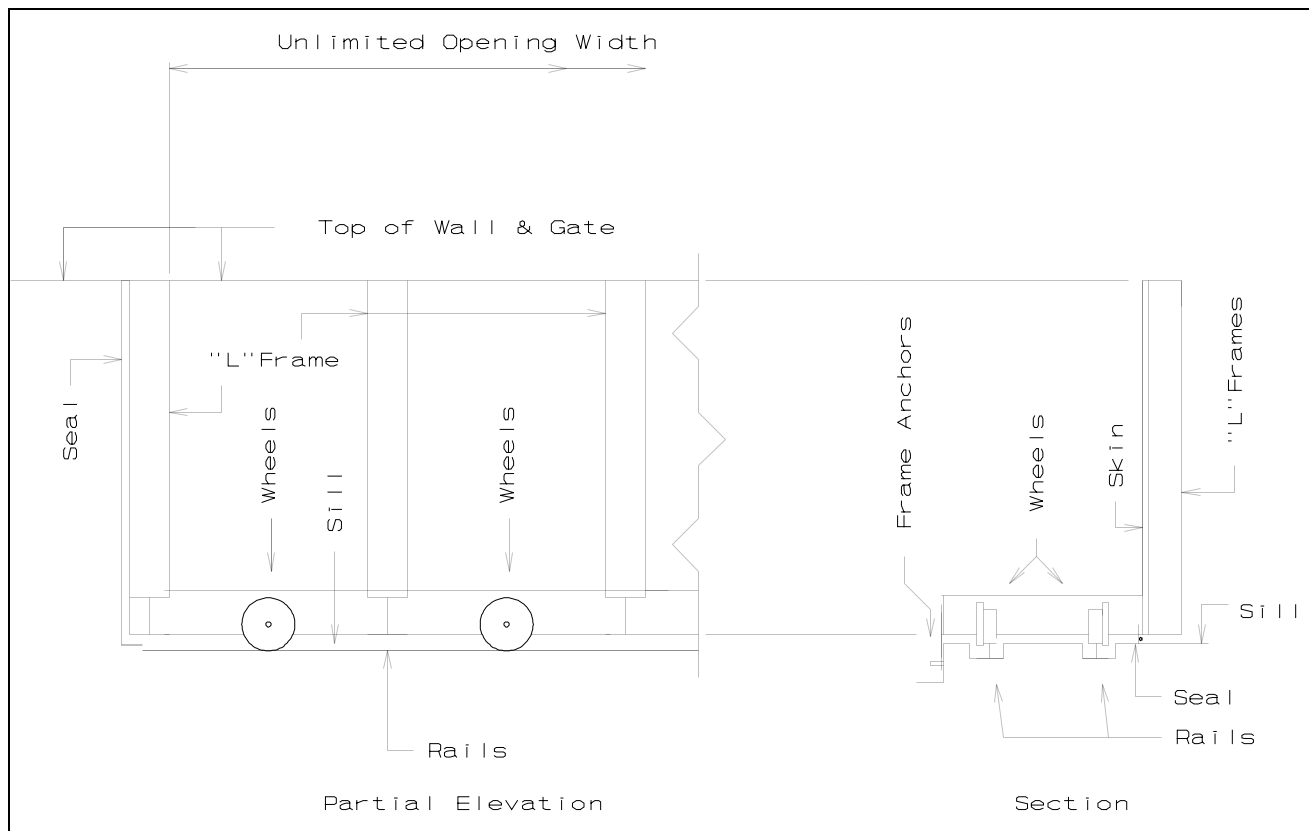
Rolling gate - L-frame stabilized by hooks
